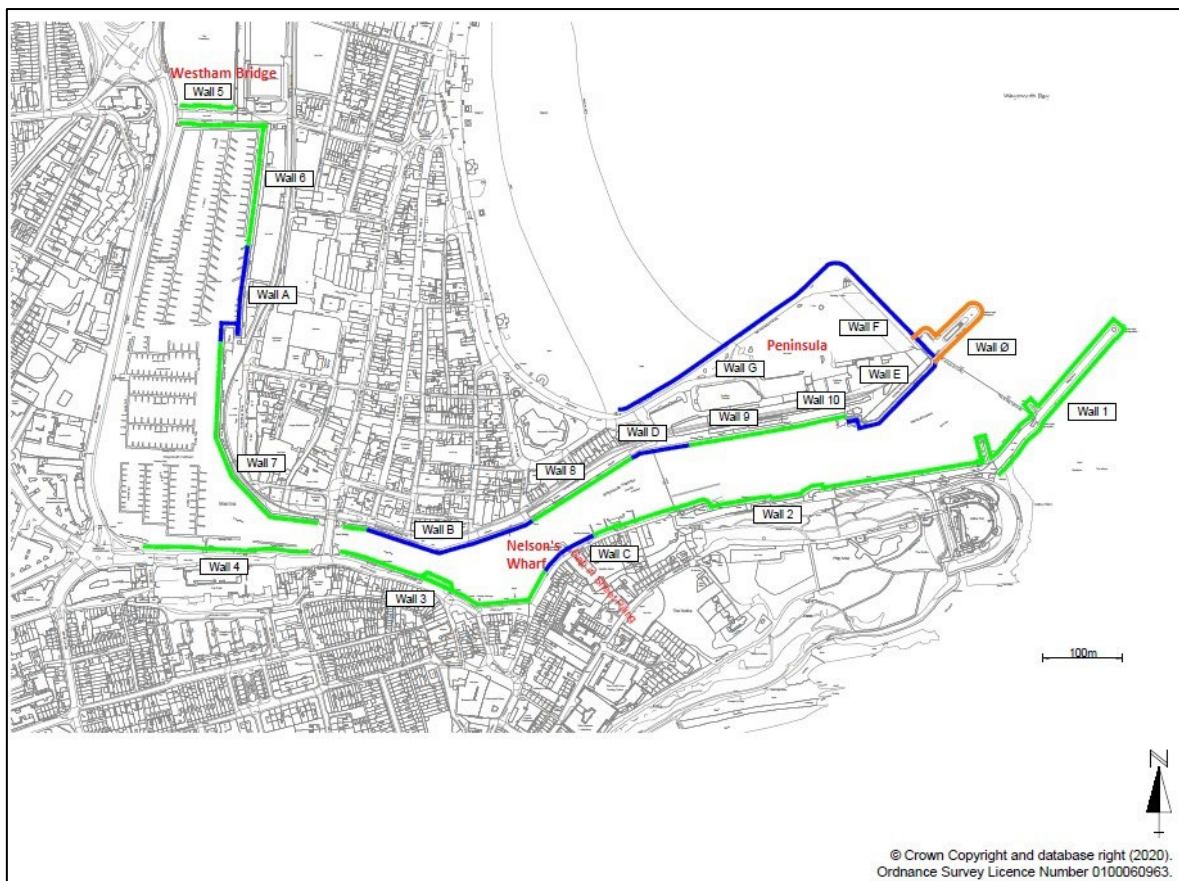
Location of Weymouth Harbour’s Steel Sheet Pile walls (in blue) and Masonry and Concrete walls (in green).
